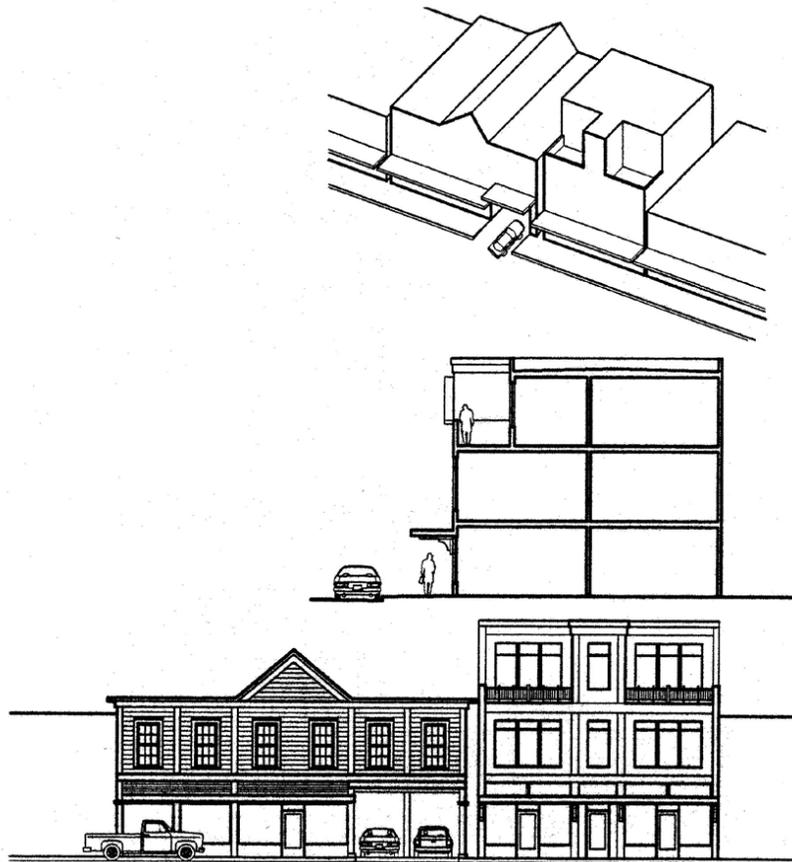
Stepping back the massing of a taller, new building, retains the typical height of the street wall. Shown here, the stepped back portion forms private balconies for residential or office use. Stepping down the massing of the new building mitigates the difference between adjacent building heights. Here, the third story contains a covered balcony with a corner column. At the fourth story, the balcony opens to the sky above.
